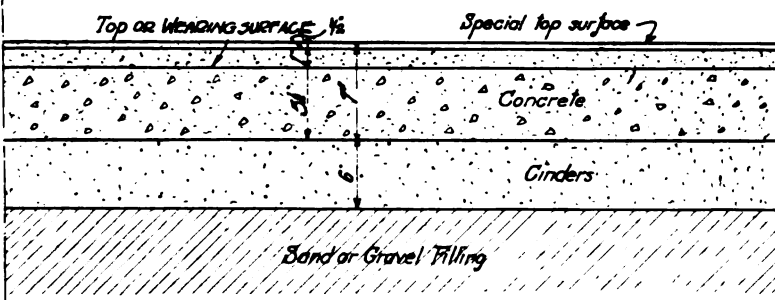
SPECIAL SURFACE ON CONCRETE FLOOR.
